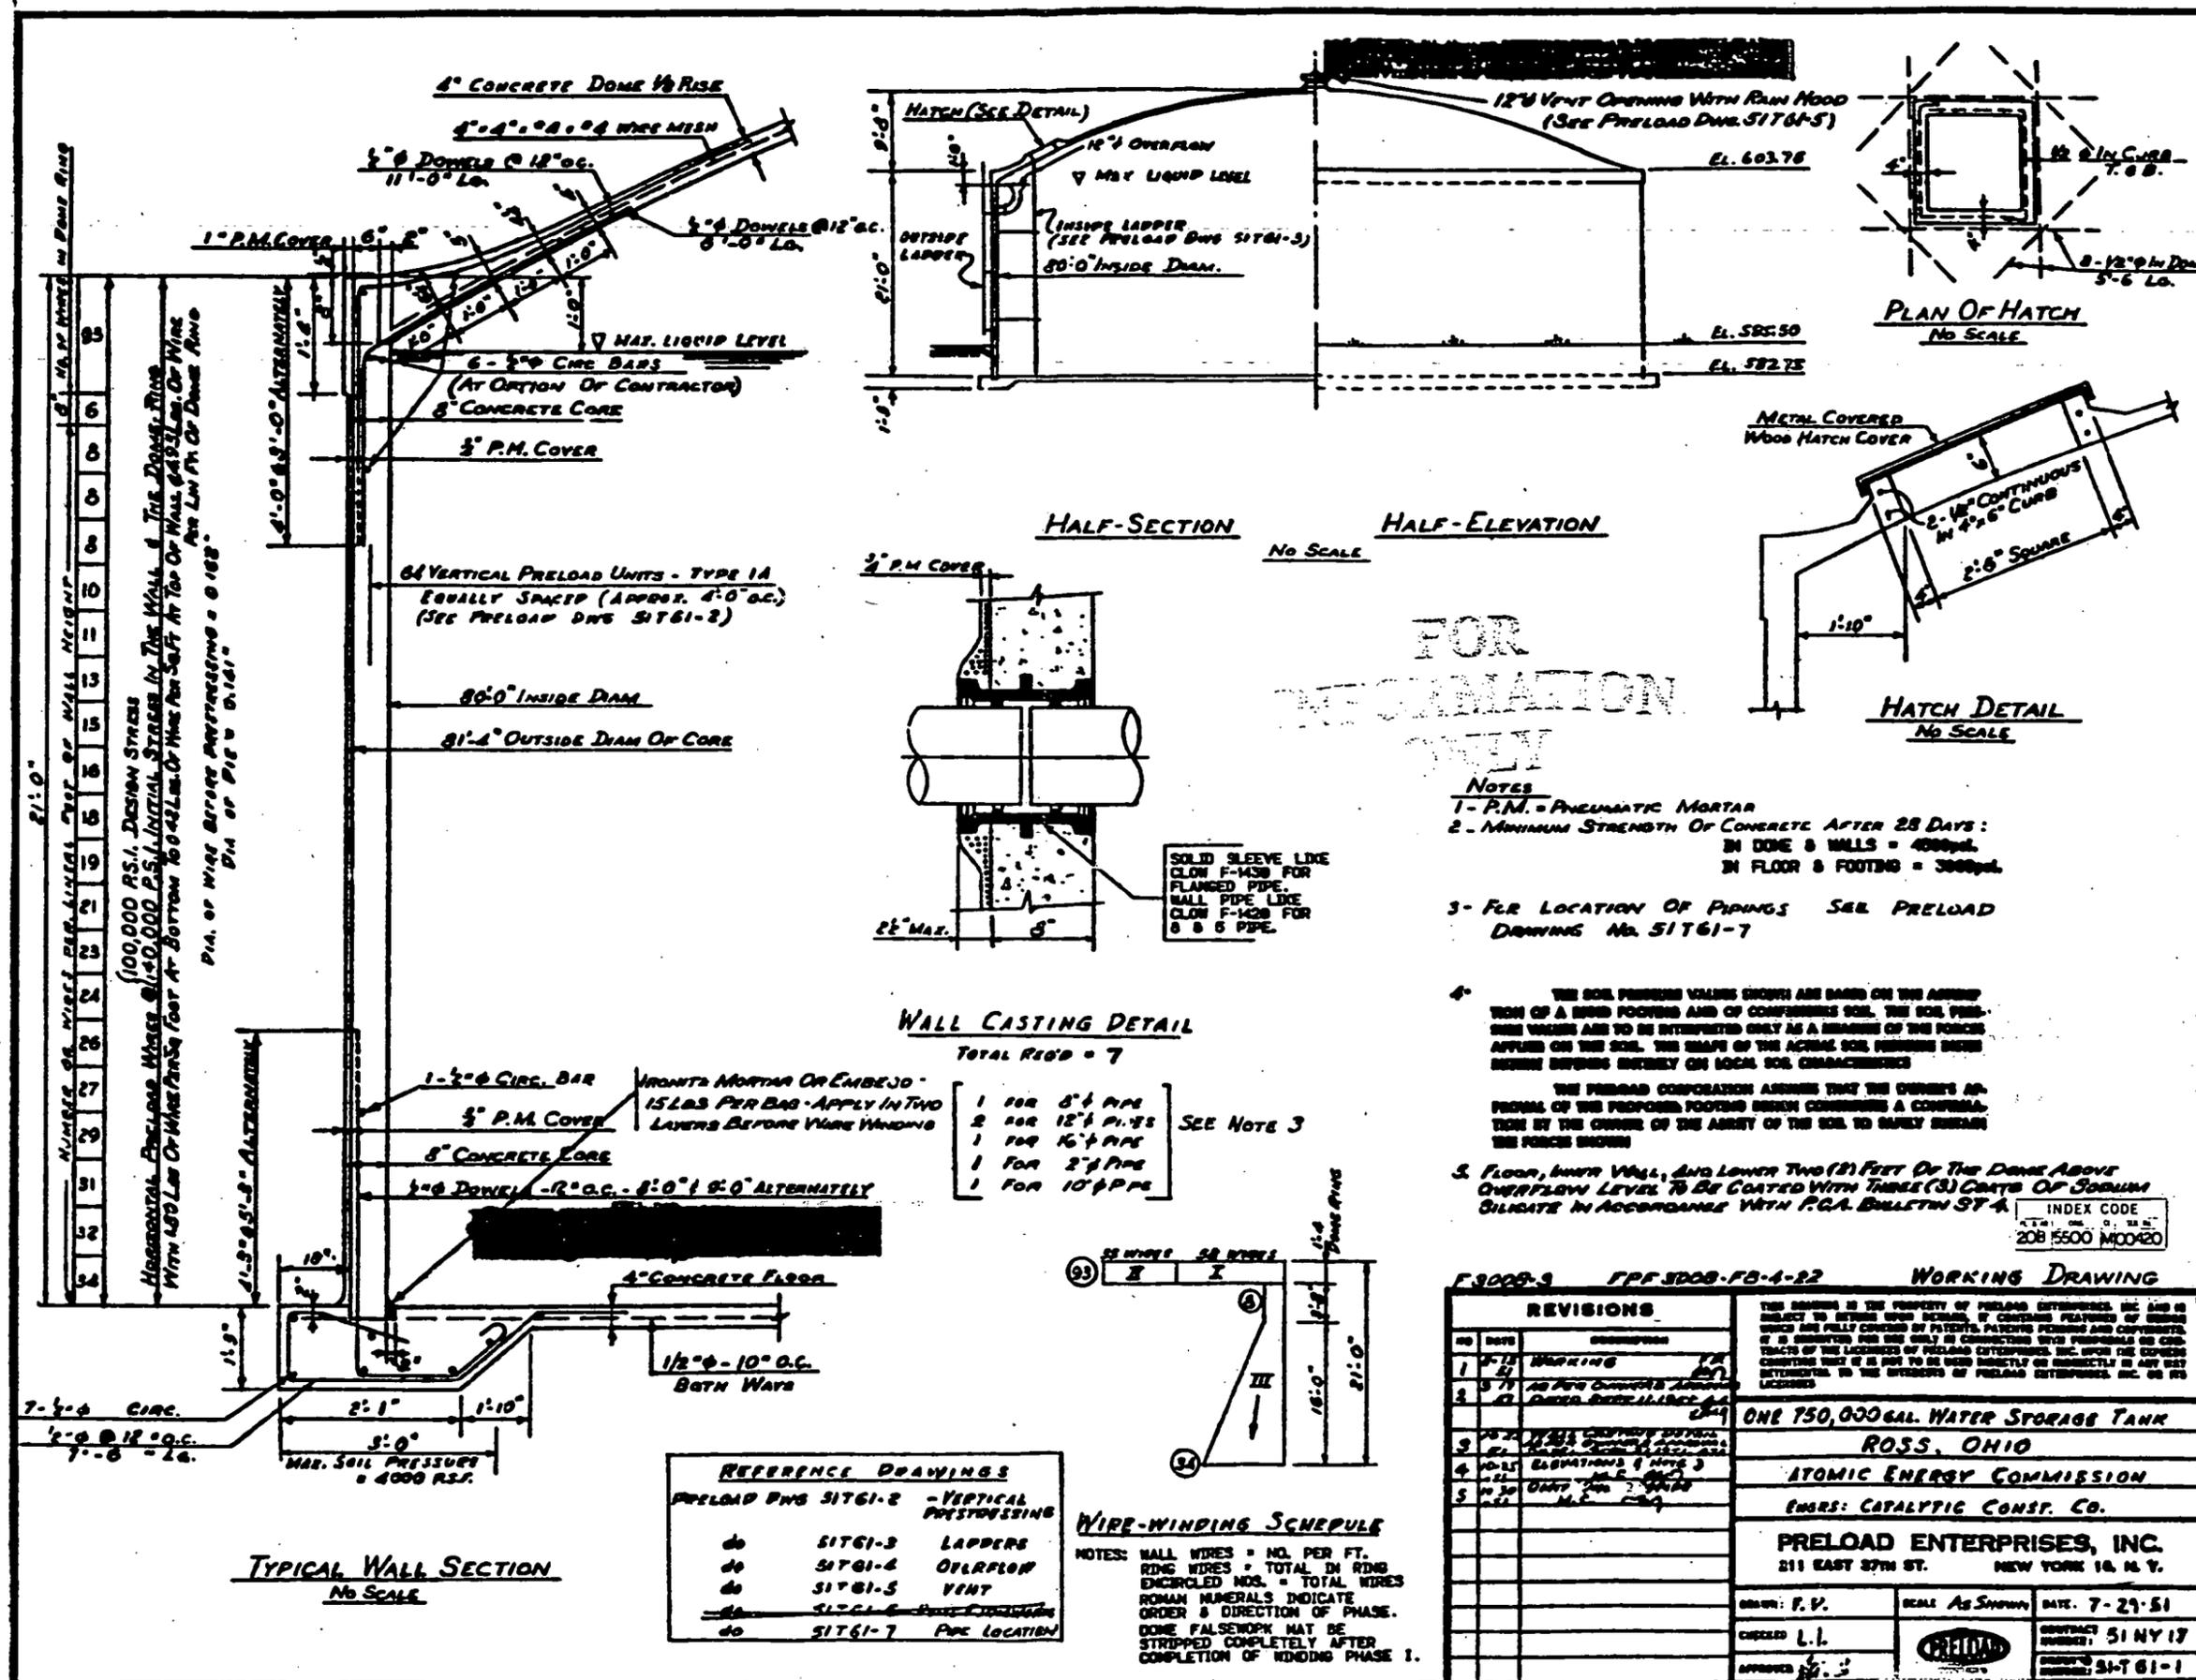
Elevation and Sections, Component 20H Process water Storage Tank
